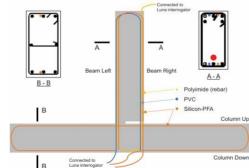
Cable layout at beam-column joints Zhang et al., (2022)
